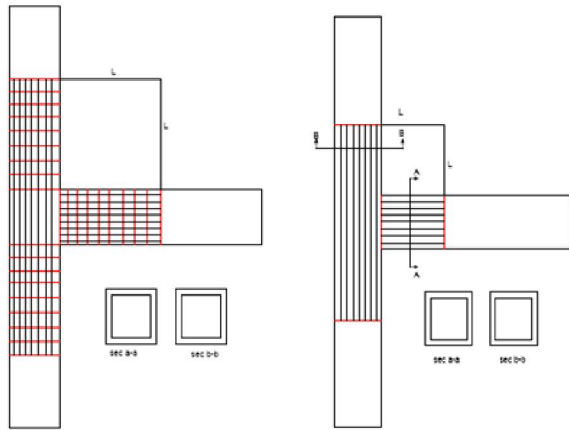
The specimen of strengthened external joints E₃₃-E₄₅, before and after beam and column wrapping
